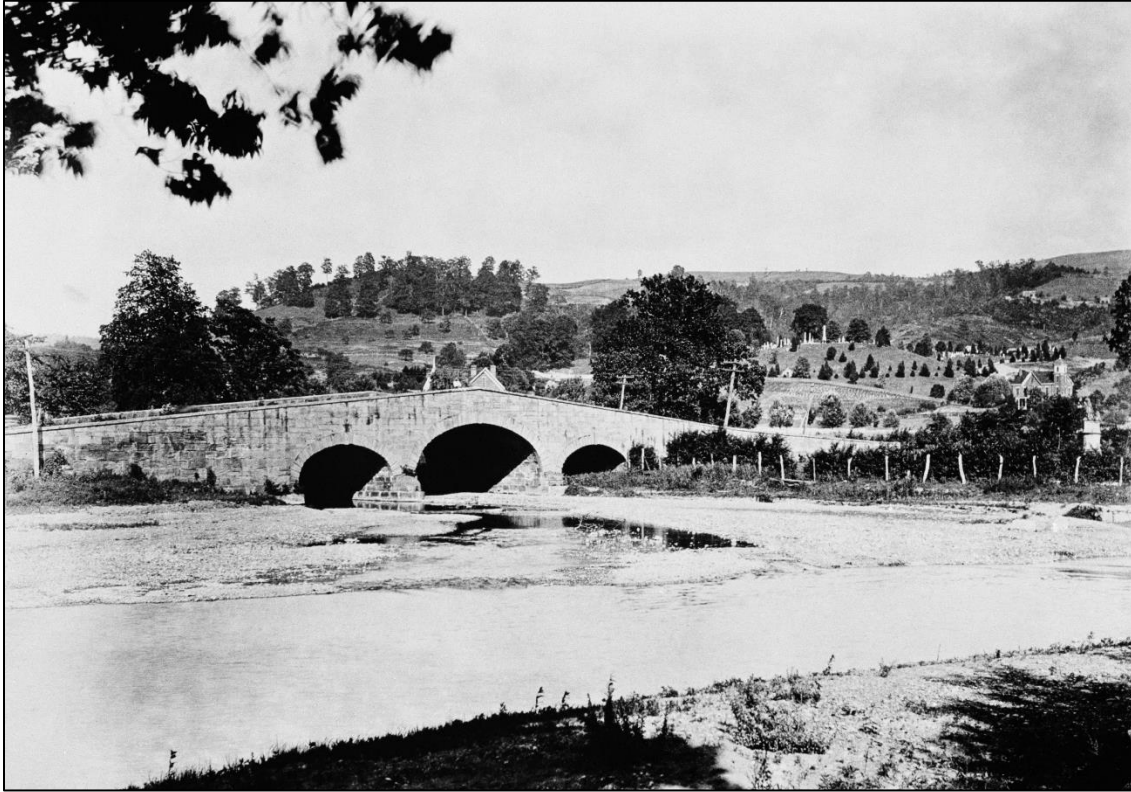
Monument Place Bridge, undated, looking southeast. “S Bridge,” Catalog No. 0163-01, Eddie Martin Collection, West Virginia State Archives. Although identified by the repository as being the S Bridge, this photograph captures the Monument Place Bridge.
